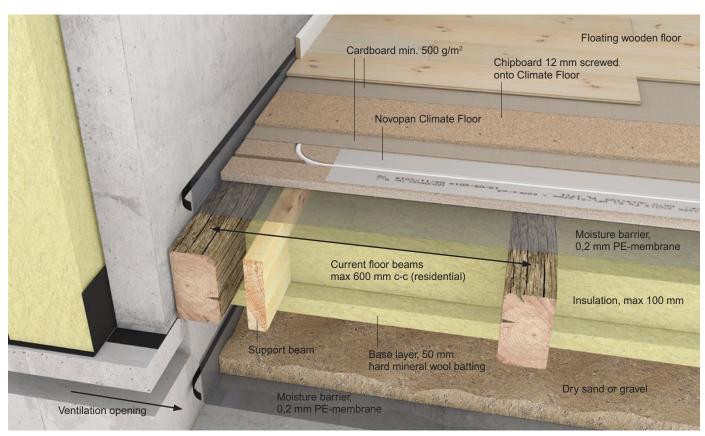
Novopan Climate Floor laid on an older crawl space deck and finished with a floating wooden floor.
